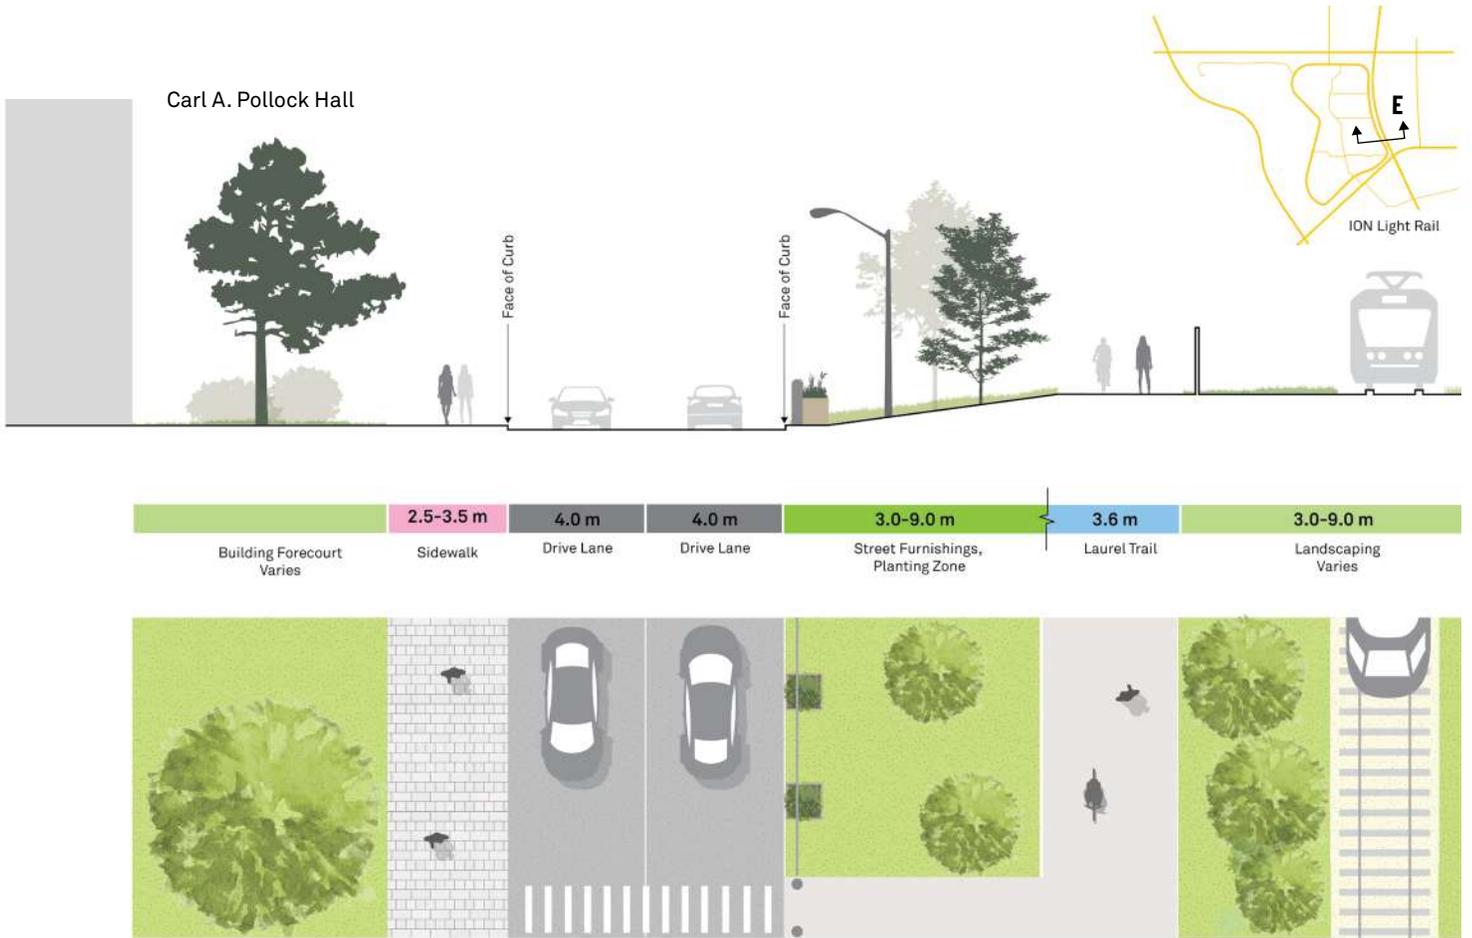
Section E. Existing condition of Ring Road (southeast edge).
